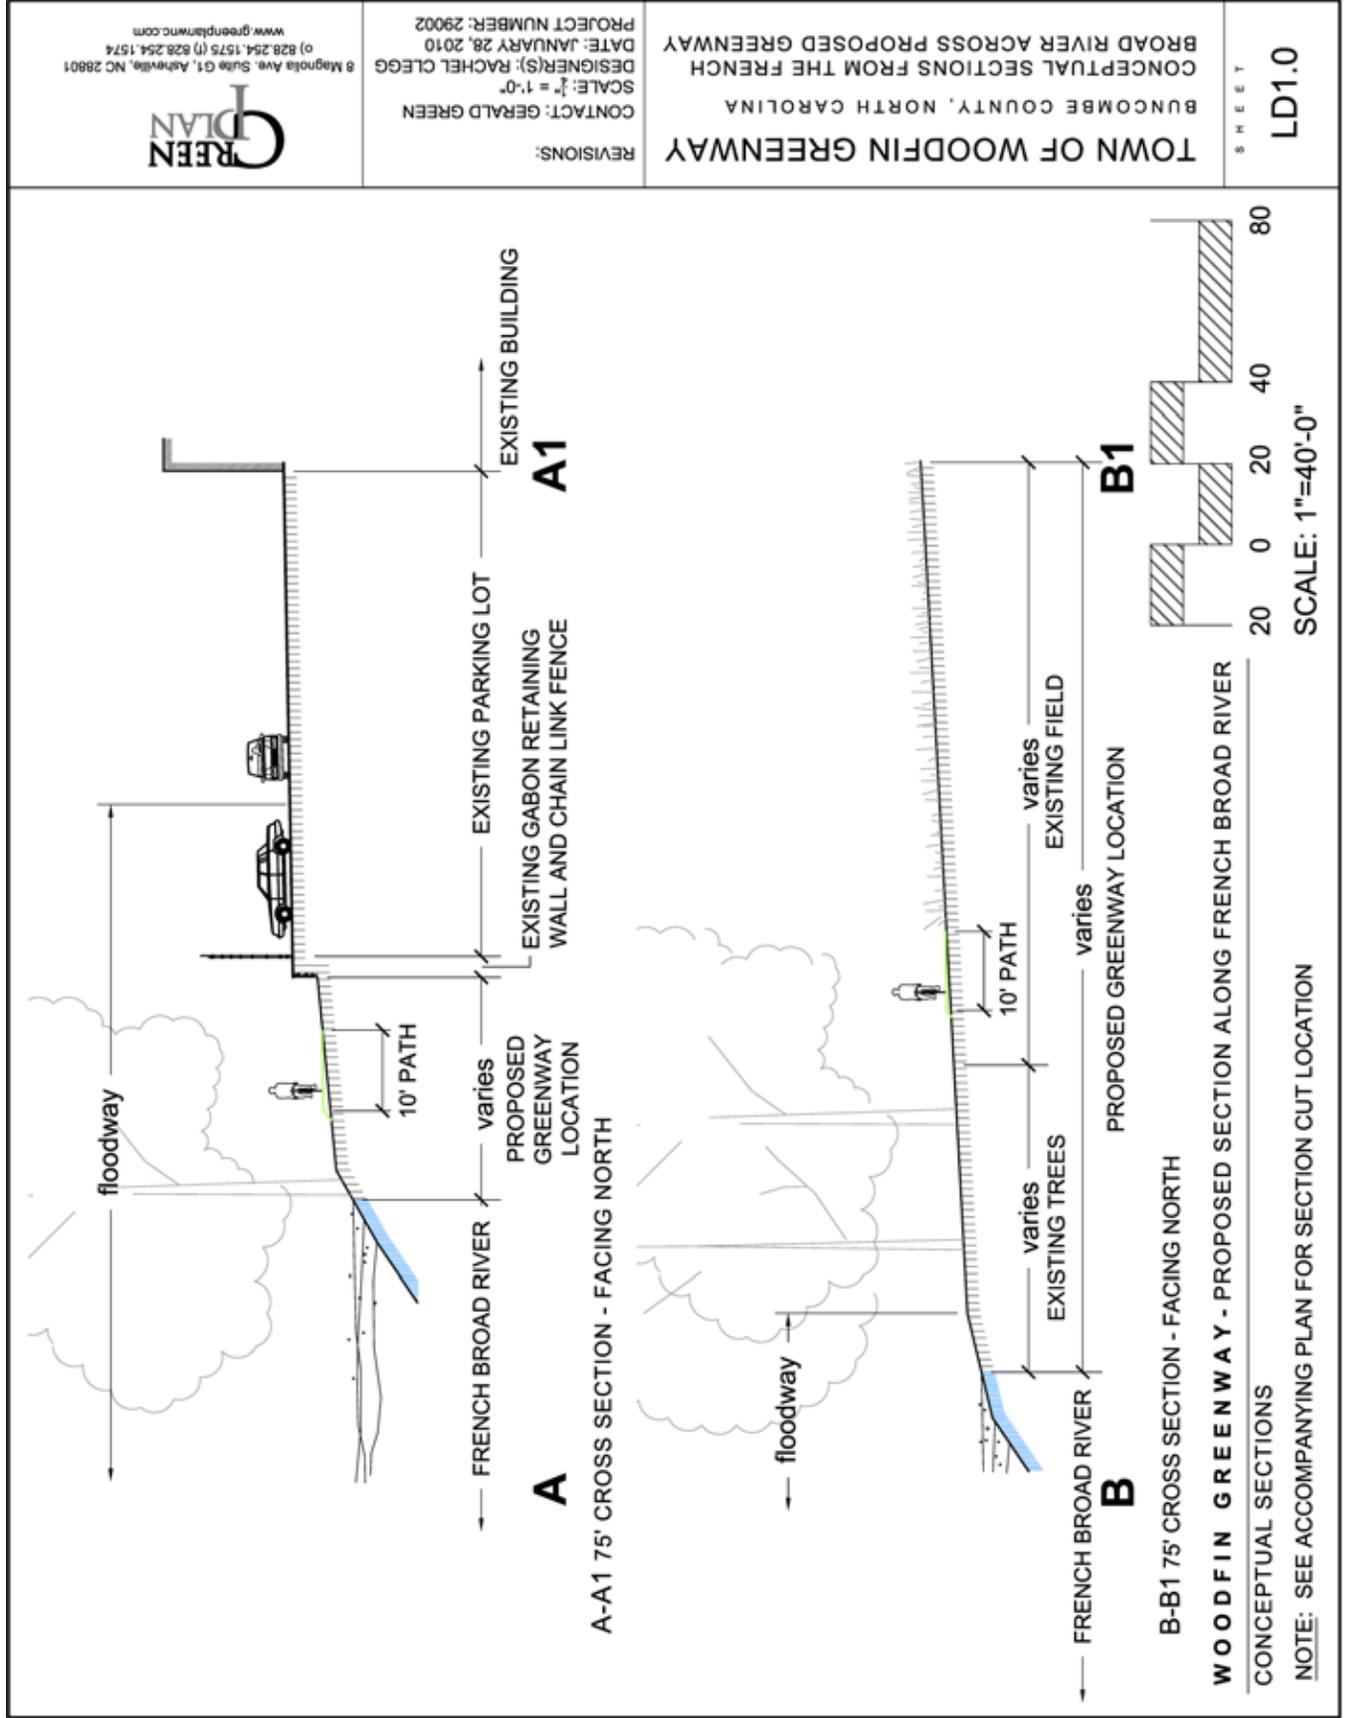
Cross Sections of Proposed Phase 1 French Broad River Greenway
